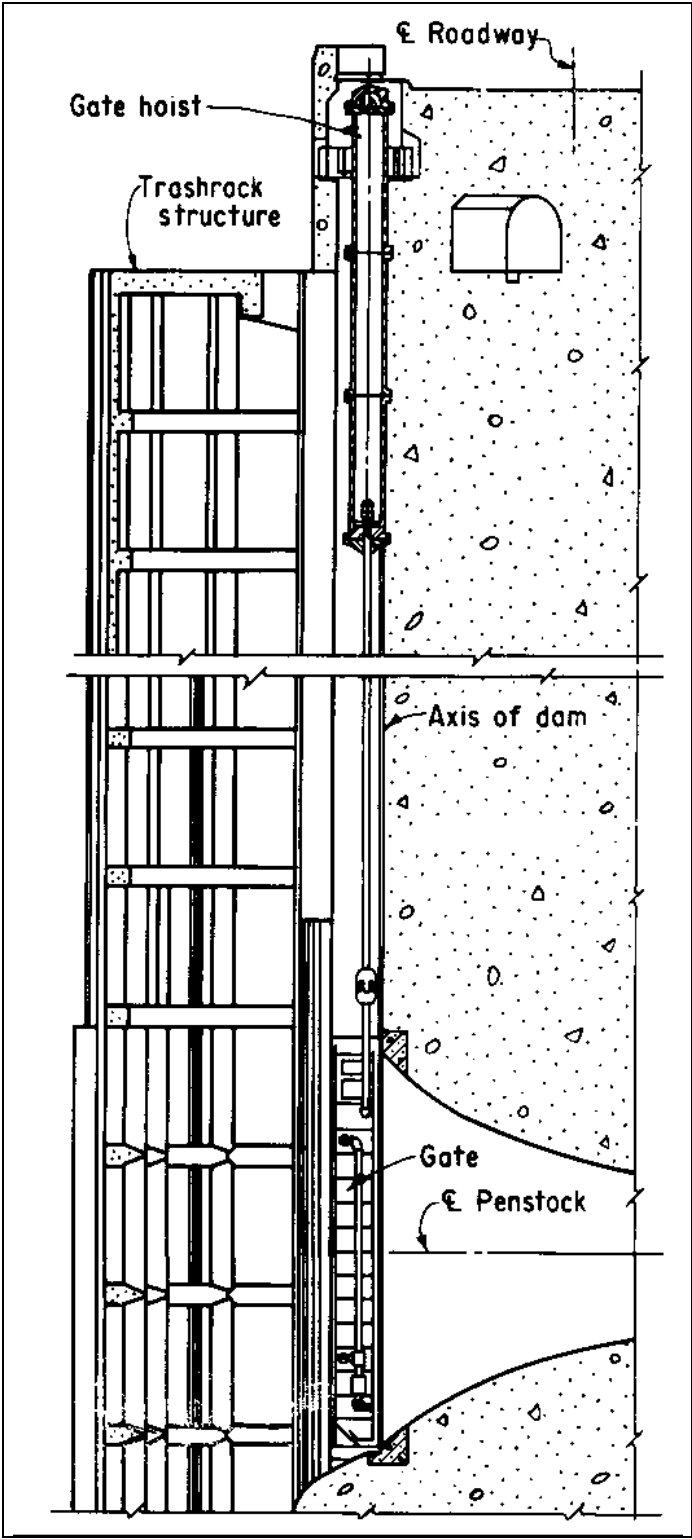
Typical fixed wheel gate installation at upstream face of dam (USBR)
